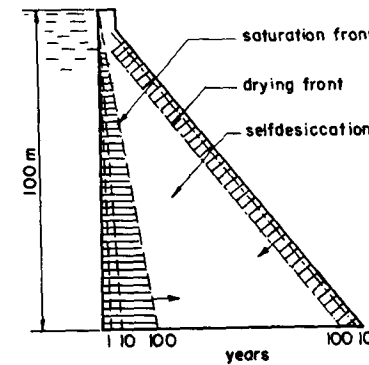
Advance of the Fronts of Saturation and of Drying in an Ideal Dam Having No Cracks, No Cracked Joints, and No Drainage (for a Typical Concrete)
